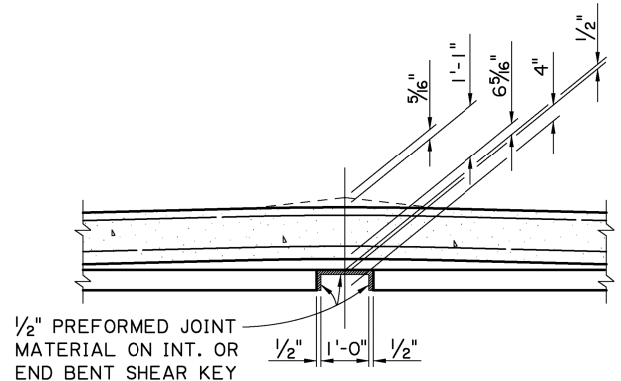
DETAIL SHOWING TYPICAL JOINT & HAUNCH
